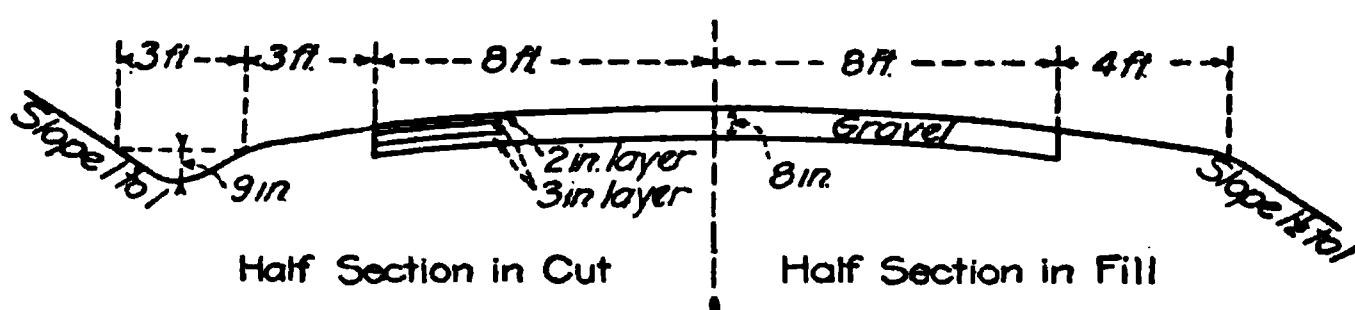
CONNECTICUT GRAVEL ROAD.
